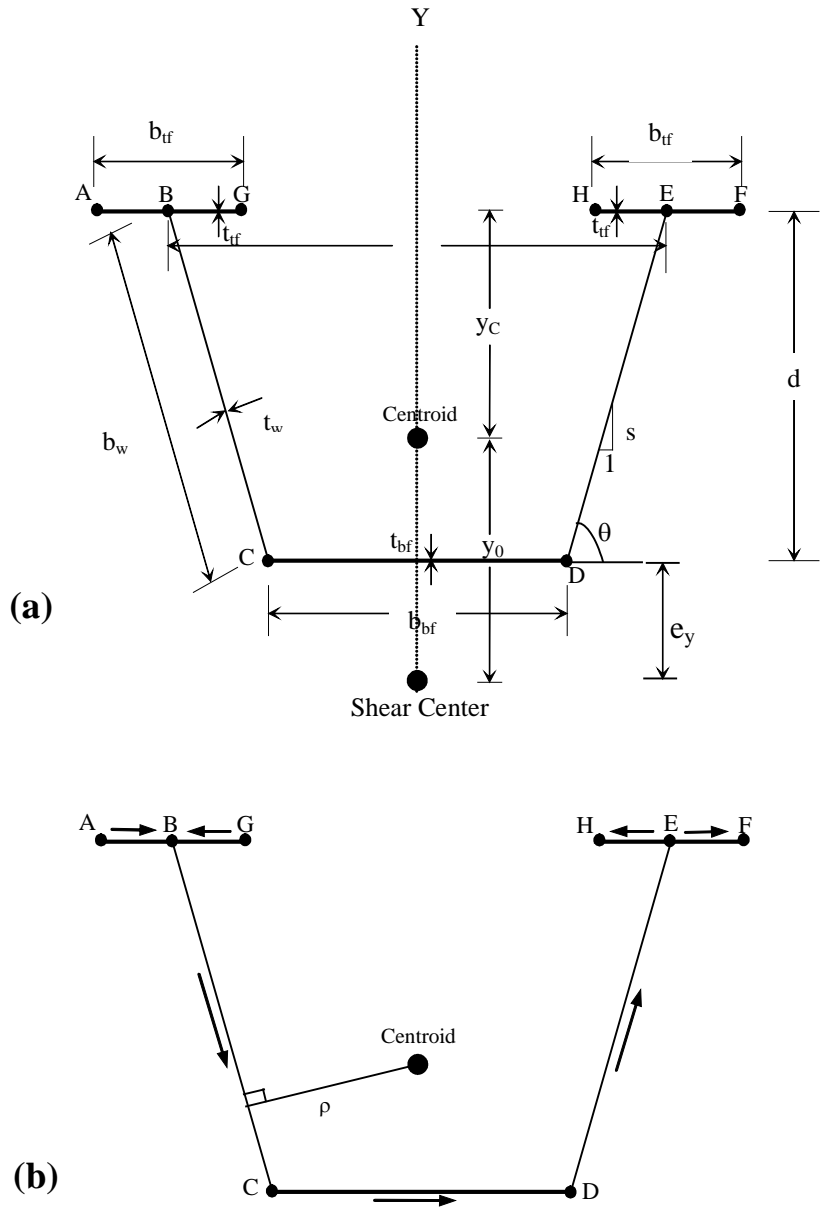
Selected element's flow vector on open-section trapezoidal box girder
